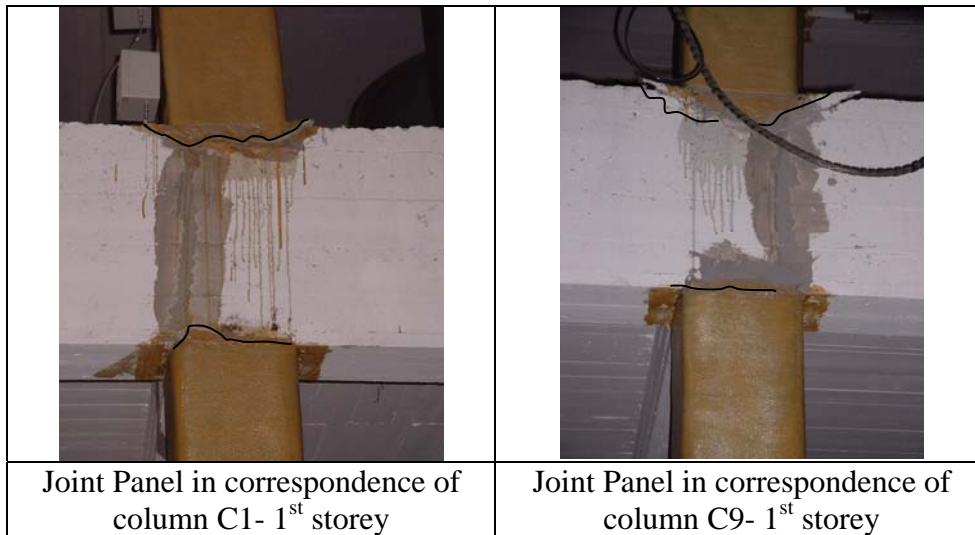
Cracks on the unstrengthened joint panels
